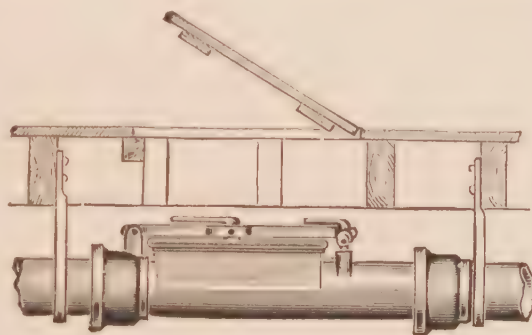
Access Pipe or Hatch Box on Iron Drain.
